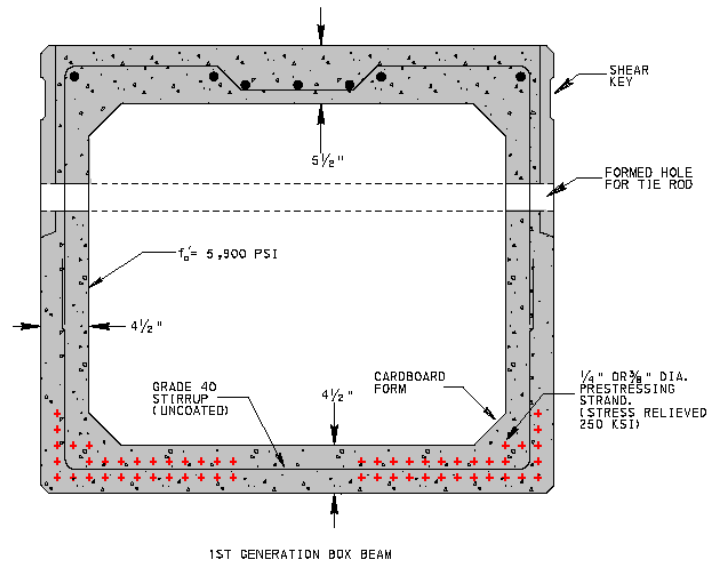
PennDOT 1st Generation Noncomposite Adjacent Prestressed Concrete Box Beam
